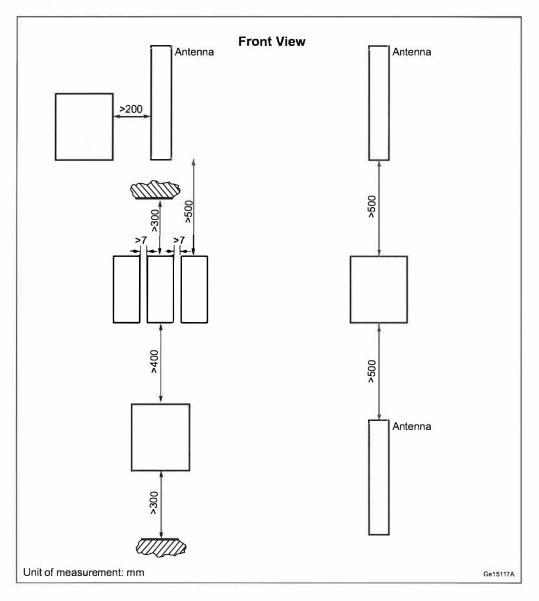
Radio Outdoor Wall Installation Requirements (R-state < R5 or R-state \ge R5 with fan)
